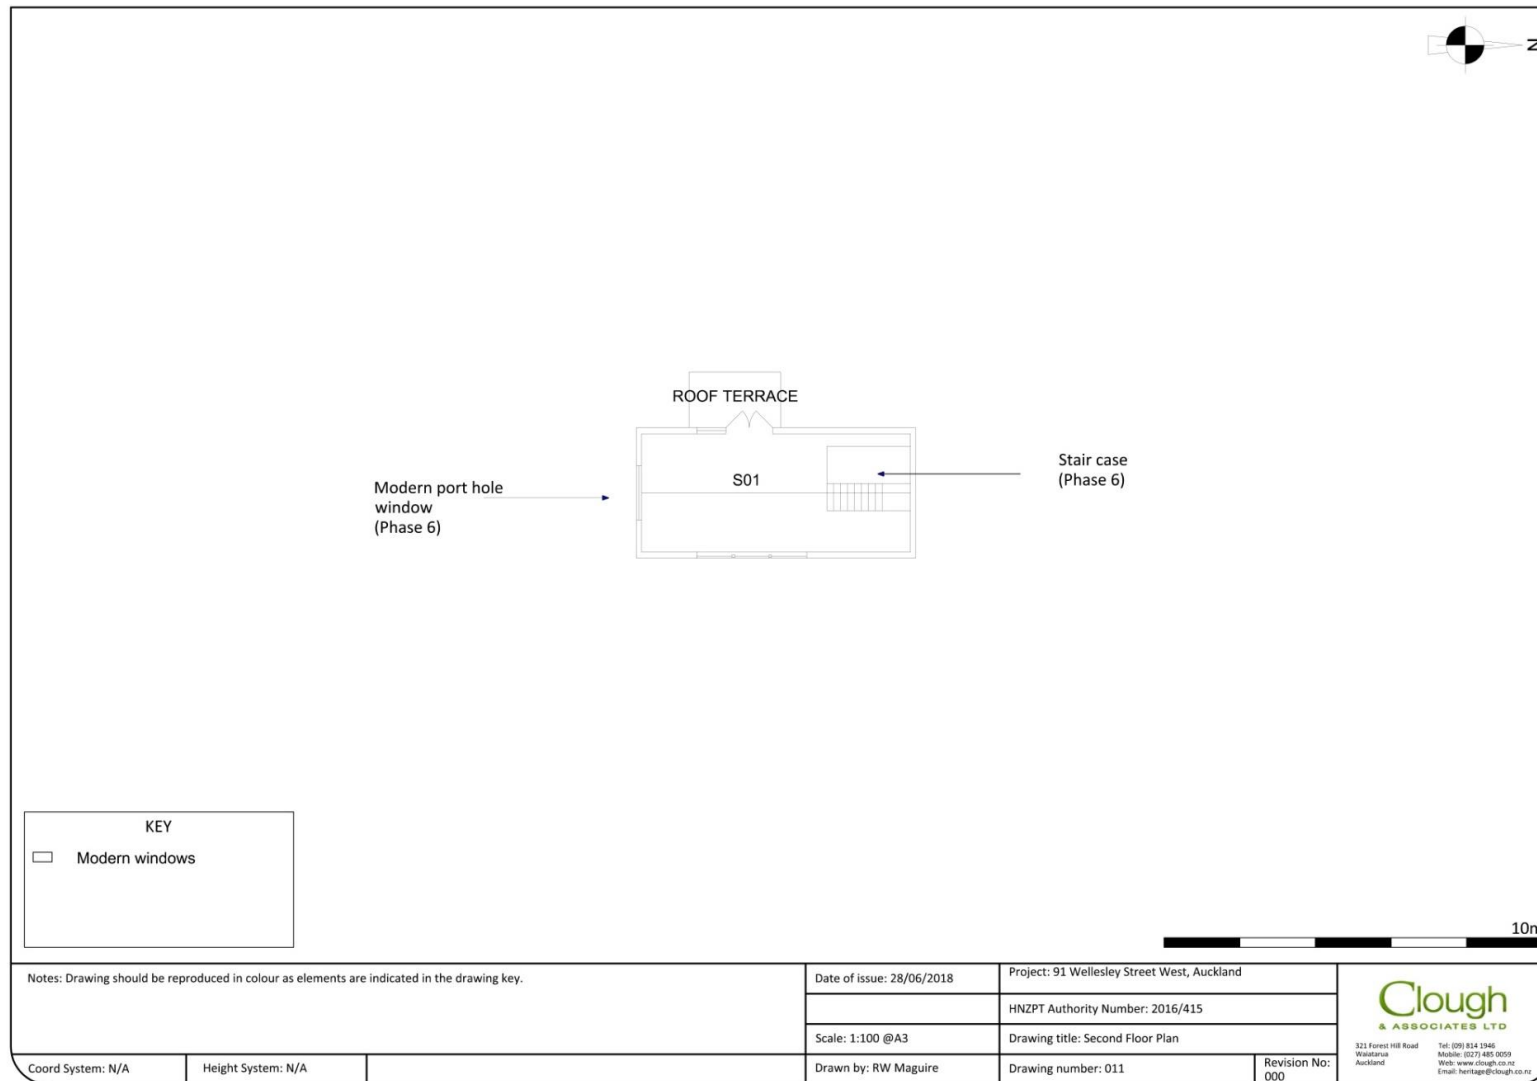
Plan of second floor of 91 Wellesley Street West (source: Clough & Associates, 2015)
